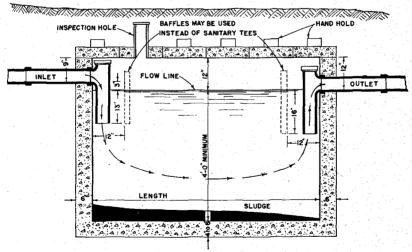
Cross section of a septic tank. Note the inspection hole in the cover slab that is used to pump out the sludge without removing the cover slab. Submerged inlets and outlets are necessary to reduce disturbance and prevent scum from passing out with the effluents. Straight inlets are subject to clogging and are not recommended.
